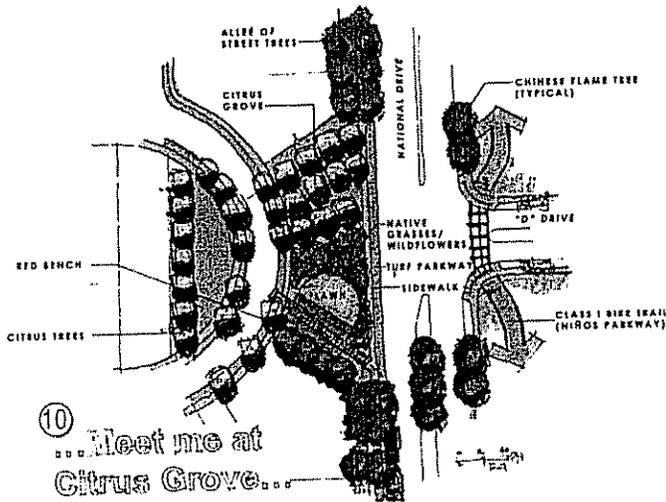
Schematic Landscape Plan 10. Citrus Grove.
